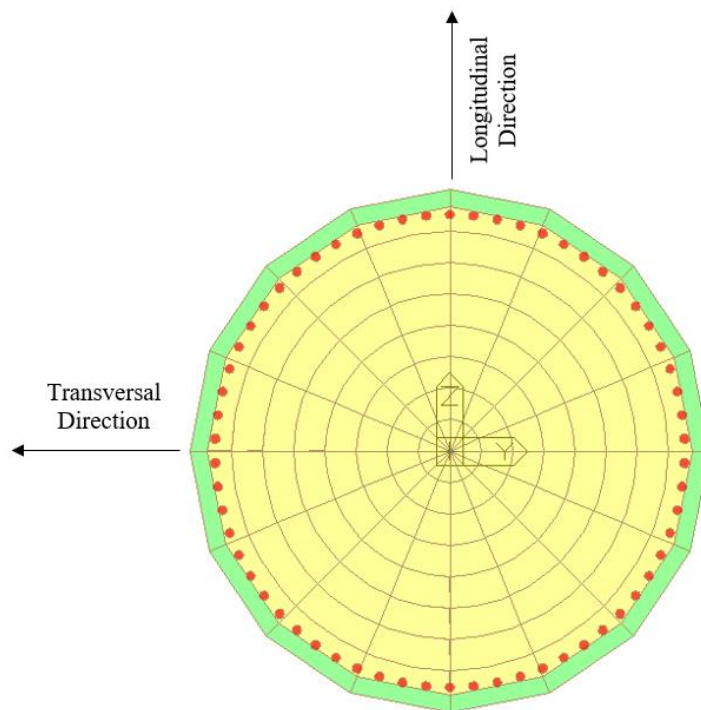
Longitudinal and transversal directions of bridge on the fiber column section
